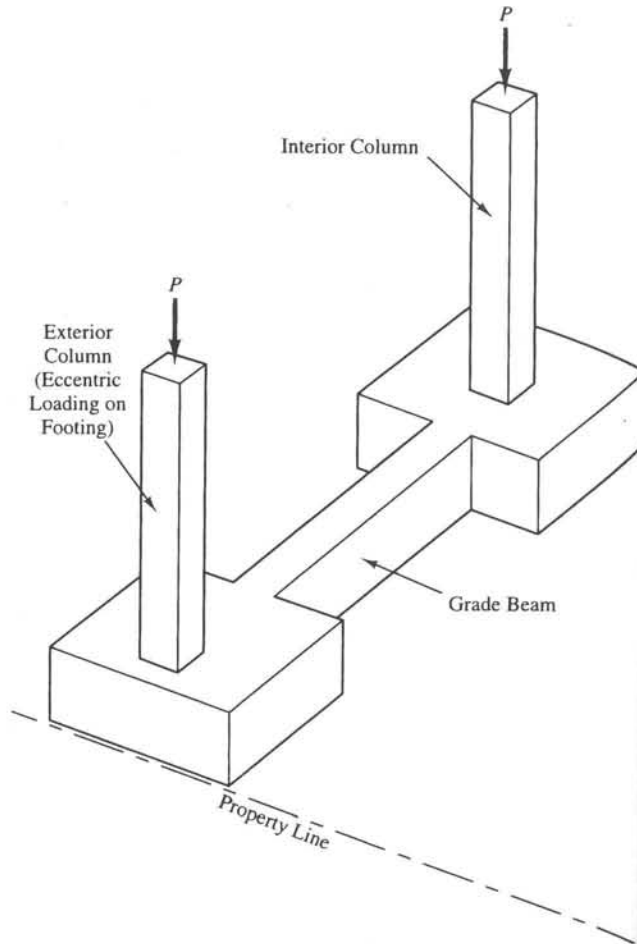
Use of a strap footing to support exterior columns when construction cannot extend beyond the property line.
